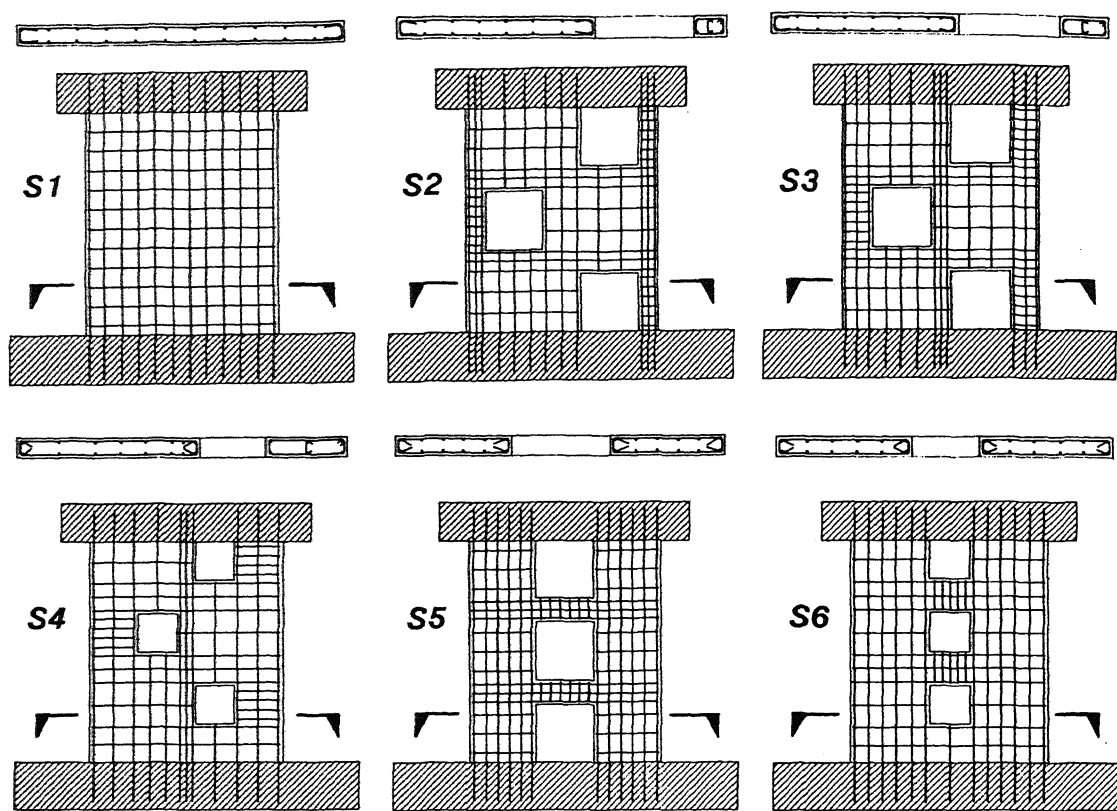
Wall specimens S1 to S6 (cross sections are shown to a larger scale).
